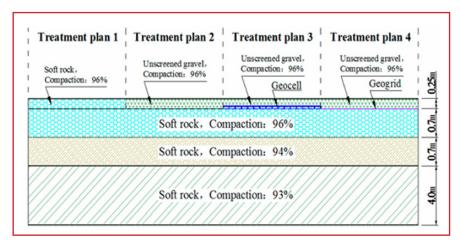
Cross-section diagrams of the soft rock subgrade reinforcement treatment plans.
